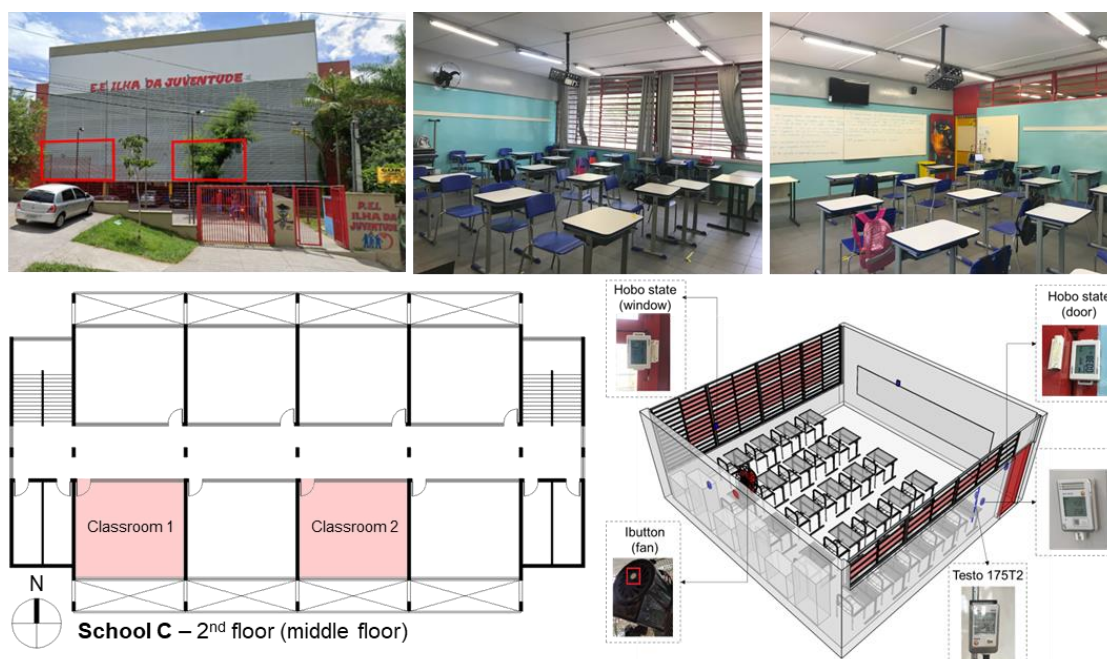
Pictures of the school and the monitored classroom, floor plan and classroom perspective (School C).
